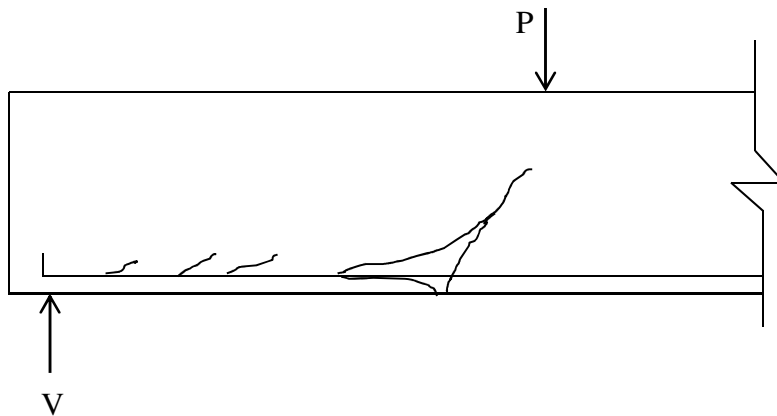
Shear tension failure, adapted from Dileep Kumar (lecture notes).
